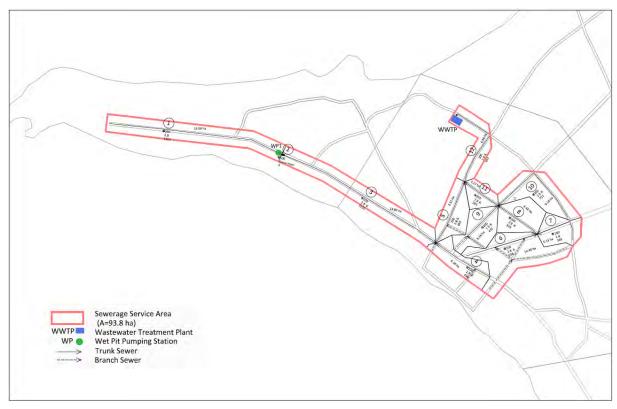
General Layout Plan of Dauis Sewerage System
